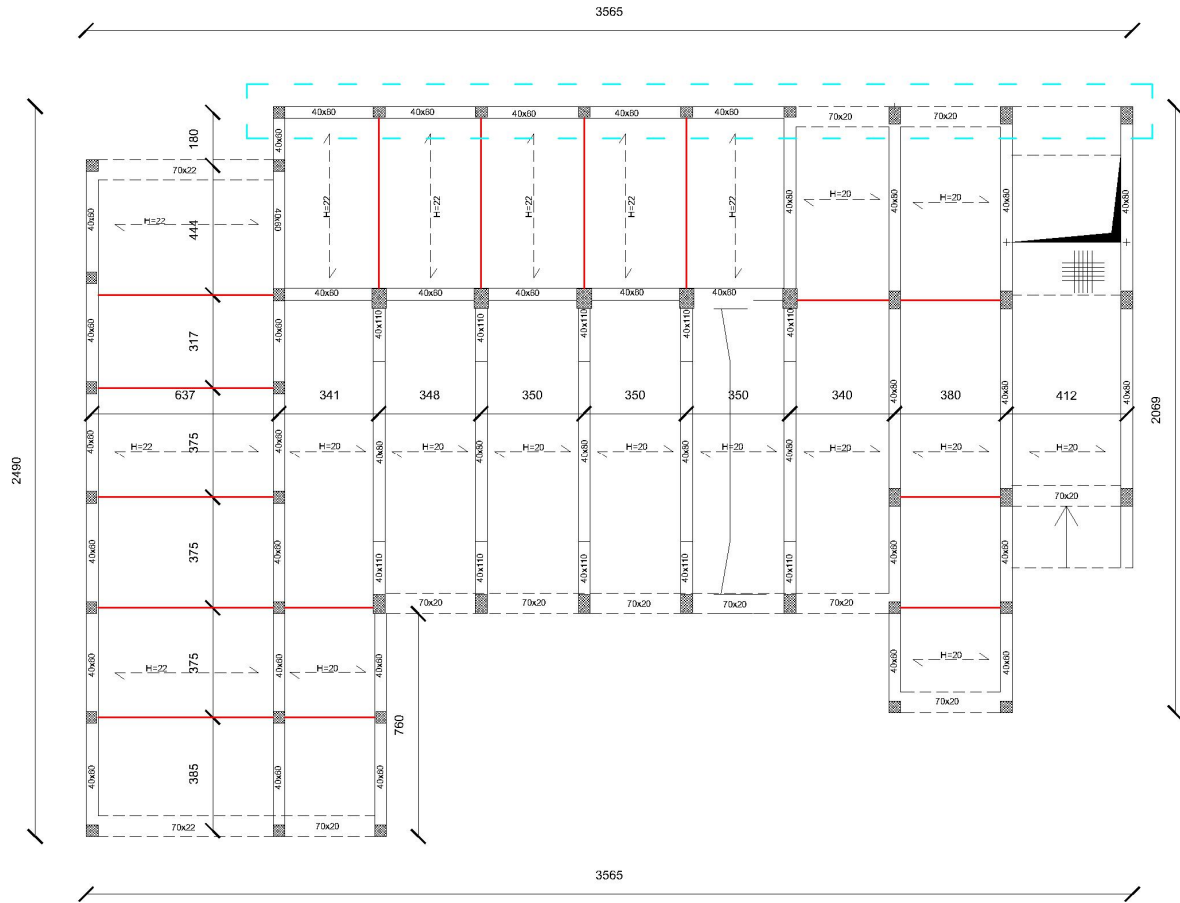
Carpentry of building study. Red signs lead full bands and double joists
